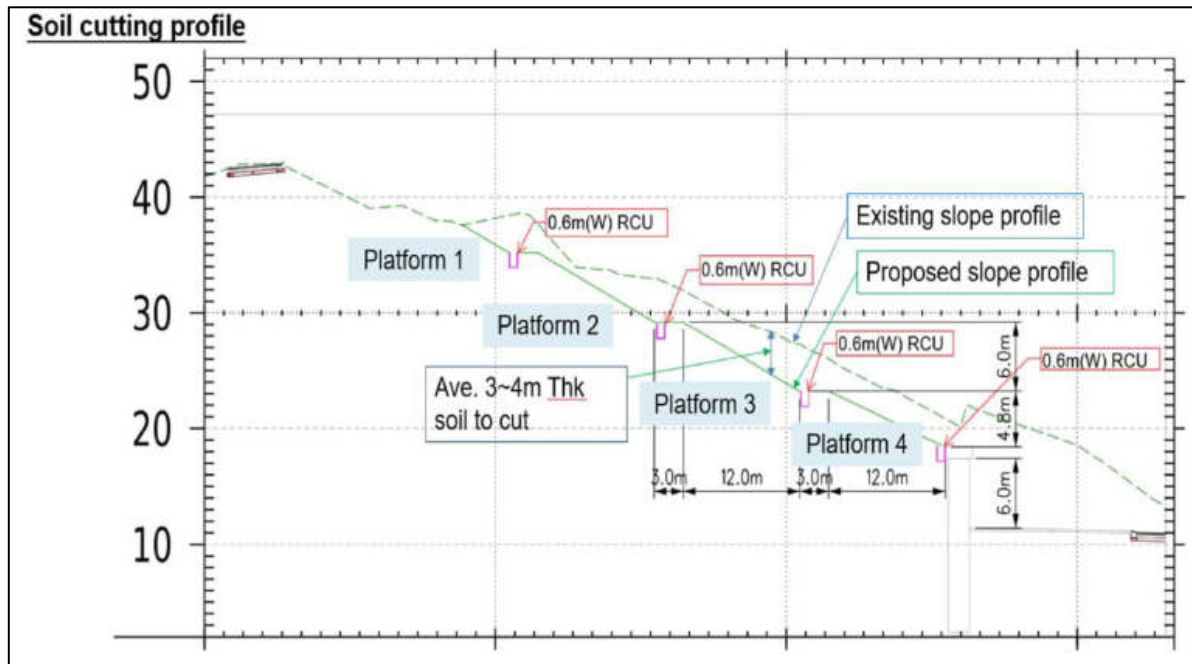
Detailed elevation view of cut slope profiles on all 4 platforms
